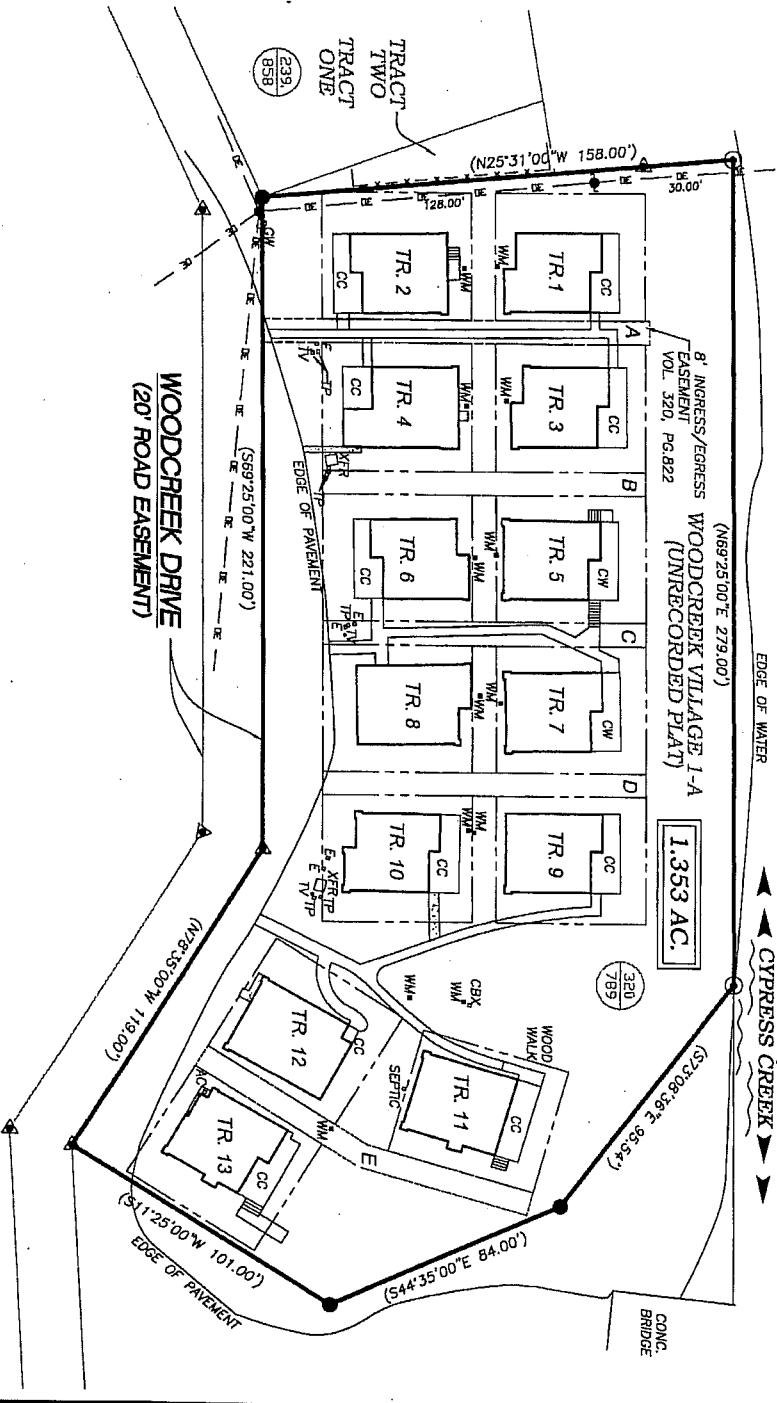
# EXHIBIT OF IMPROVEMENT LOCATIONS OF COUNTRY CABINS, WOODCREEK VILLAGE 1-A, AN UNRECORDED SUBDIVISION, BEING 1353 ACRES OUT OF THE ELIZA SNEDECOR SURVEY IN HAYS COUNTY, TEXAS
